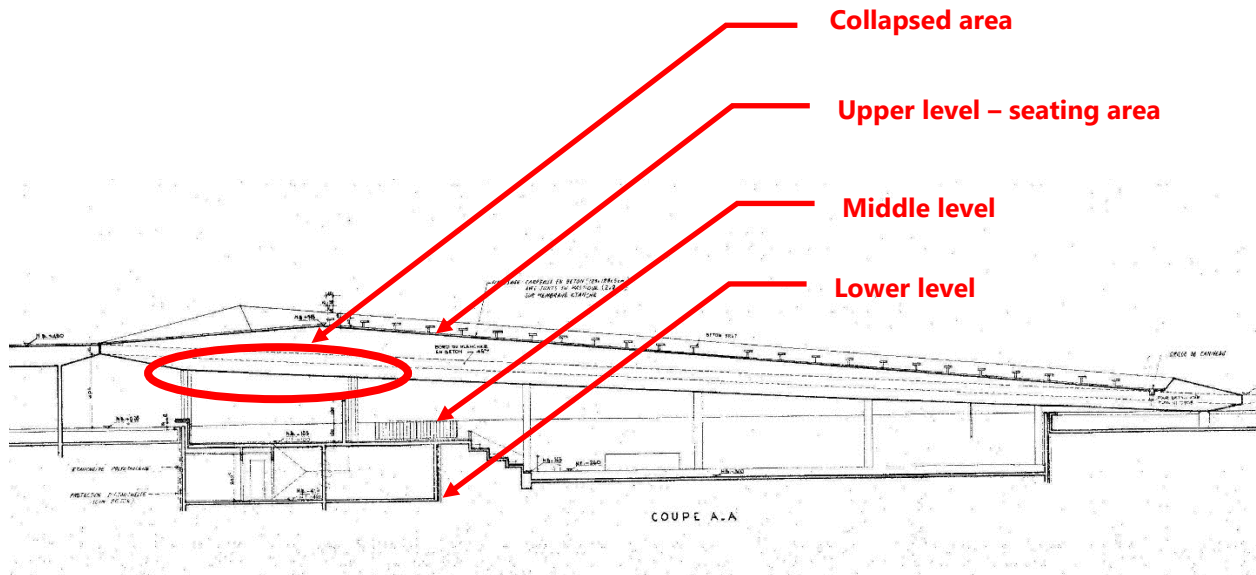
Section through OAT showing area where soffit has fallen circled in red (Darr el Handasah Consulting Engineers, A106, Revision 1968)
